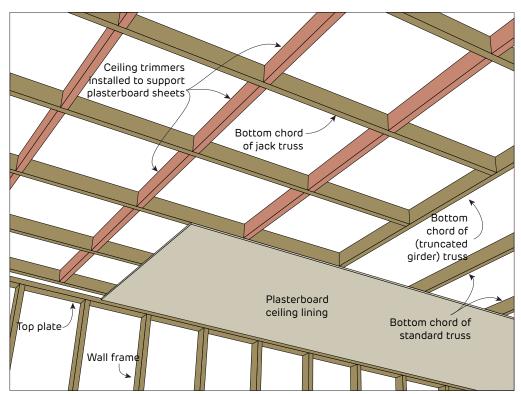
Trimmers to Support Ceiling Lining at Change of Truss DirectionPerspective
